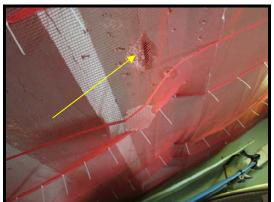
Interior ceiling of maintenance/ storage area, showing chipped concrete and exposed rebar
